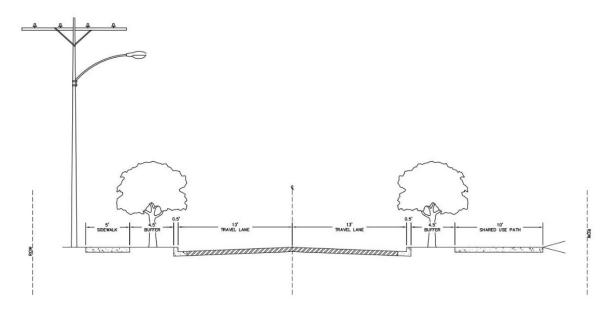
Jones Rd. / John-Liner Rd. Typical Section
